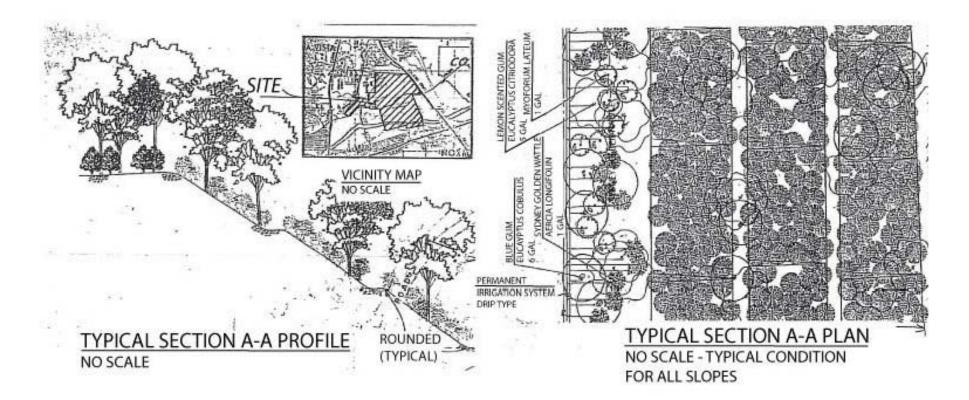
Existing Approved Reclamation Plan Revegetation Plan
